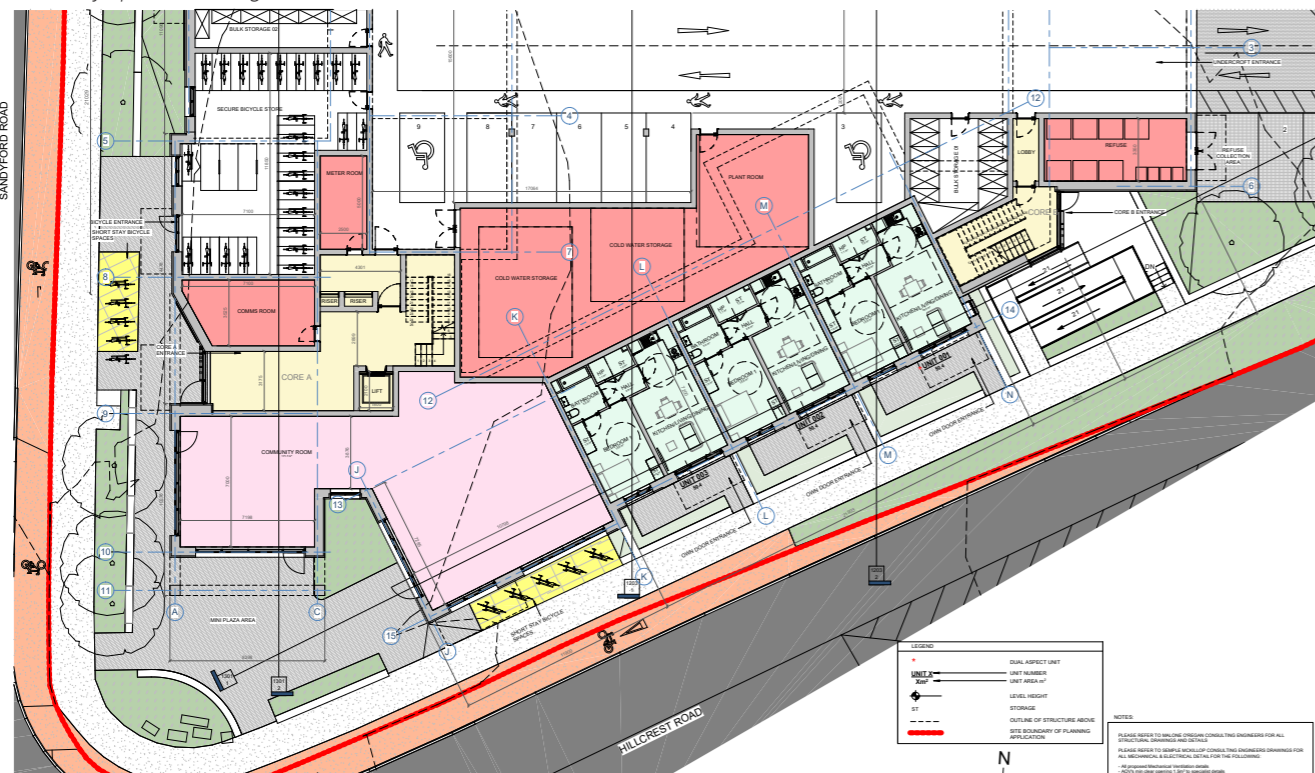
Extract from ground floor plan showing the ground floor uses and entrances from Sandyford Road on the left. own-door apartments are located on Hillcrest Road to the southern facade.
